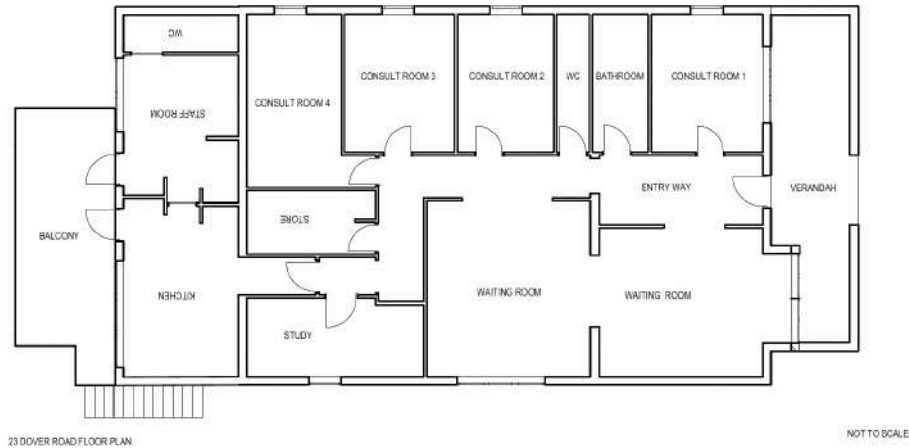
Approximate floorplan of No. 23 Dover Road, Rose Bay. Weir Phillips Heritage, 2025.
